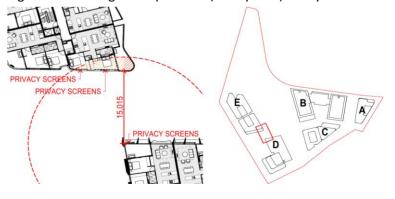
F1.2 Building D-E separation (storeys 3-9) & Key Plan
